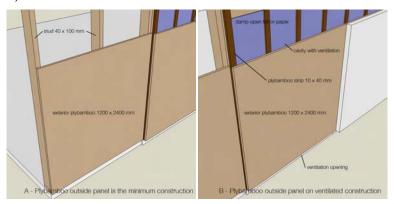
Expanding wall system with different cover and increased quality. (Structure A and B)
